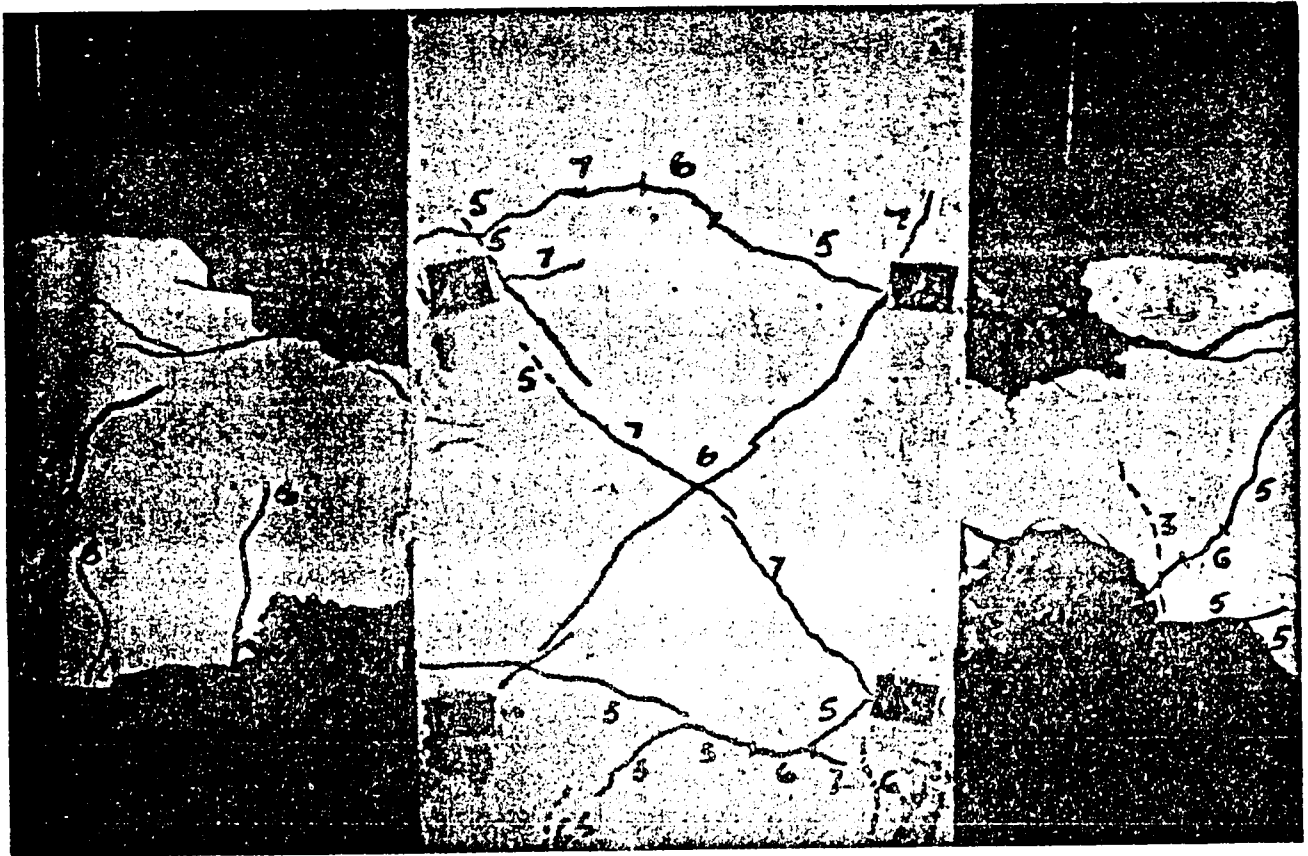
SPECIMEN 5 WHEN TEST WAS TERMINATED
